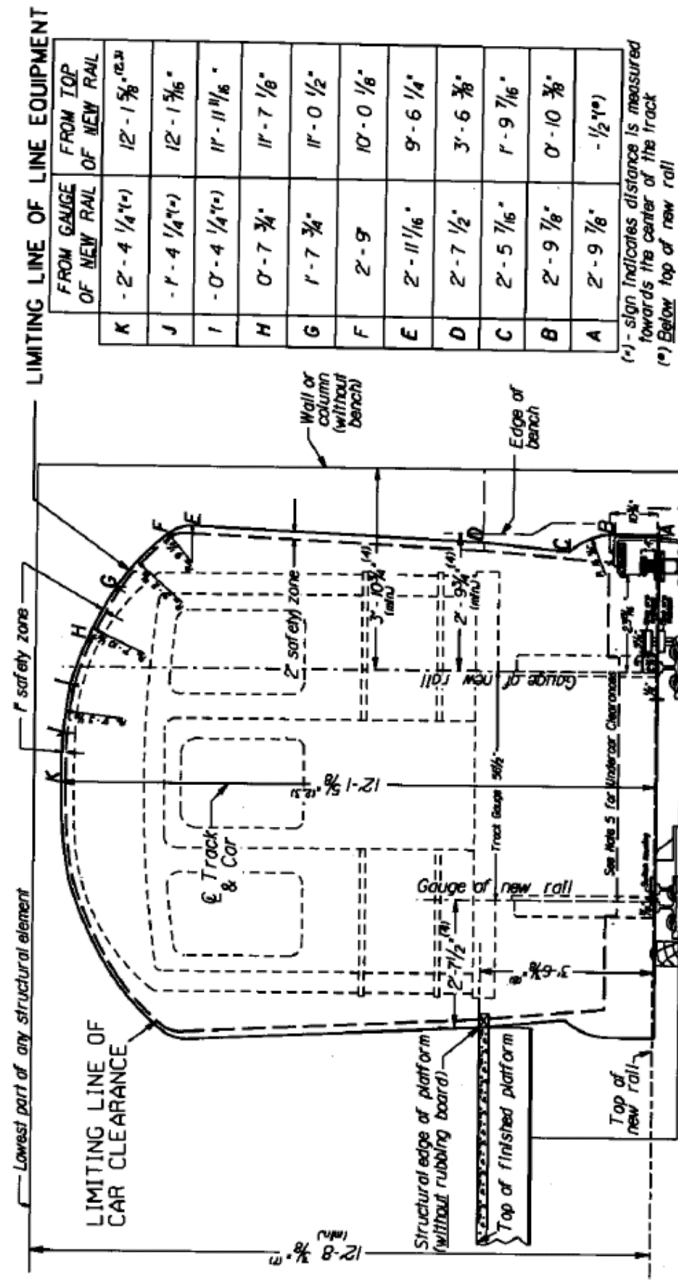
East New York Tunnel space-proofing study for LIRR M9 railroad car
